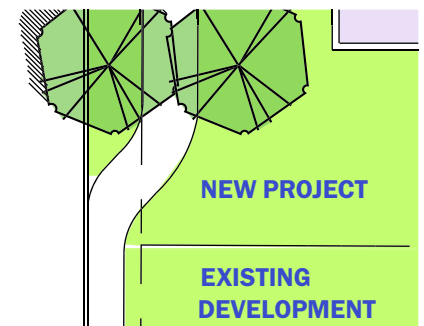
Transition from existing narrow sidewalk to new parkway/walkway.
